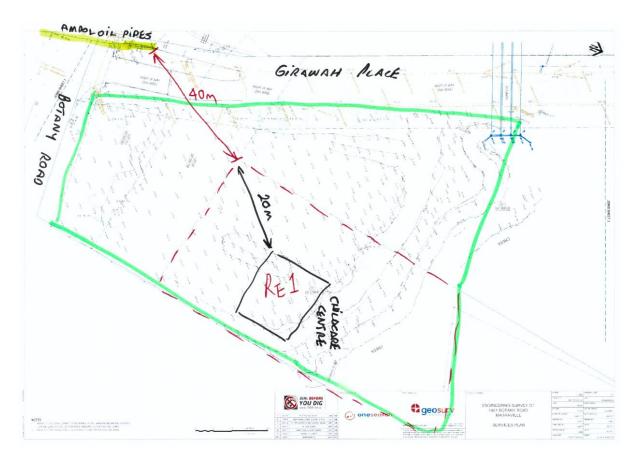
Extract of Marked Up Services Plan Indicating Pipe and Child Care Centre Location
